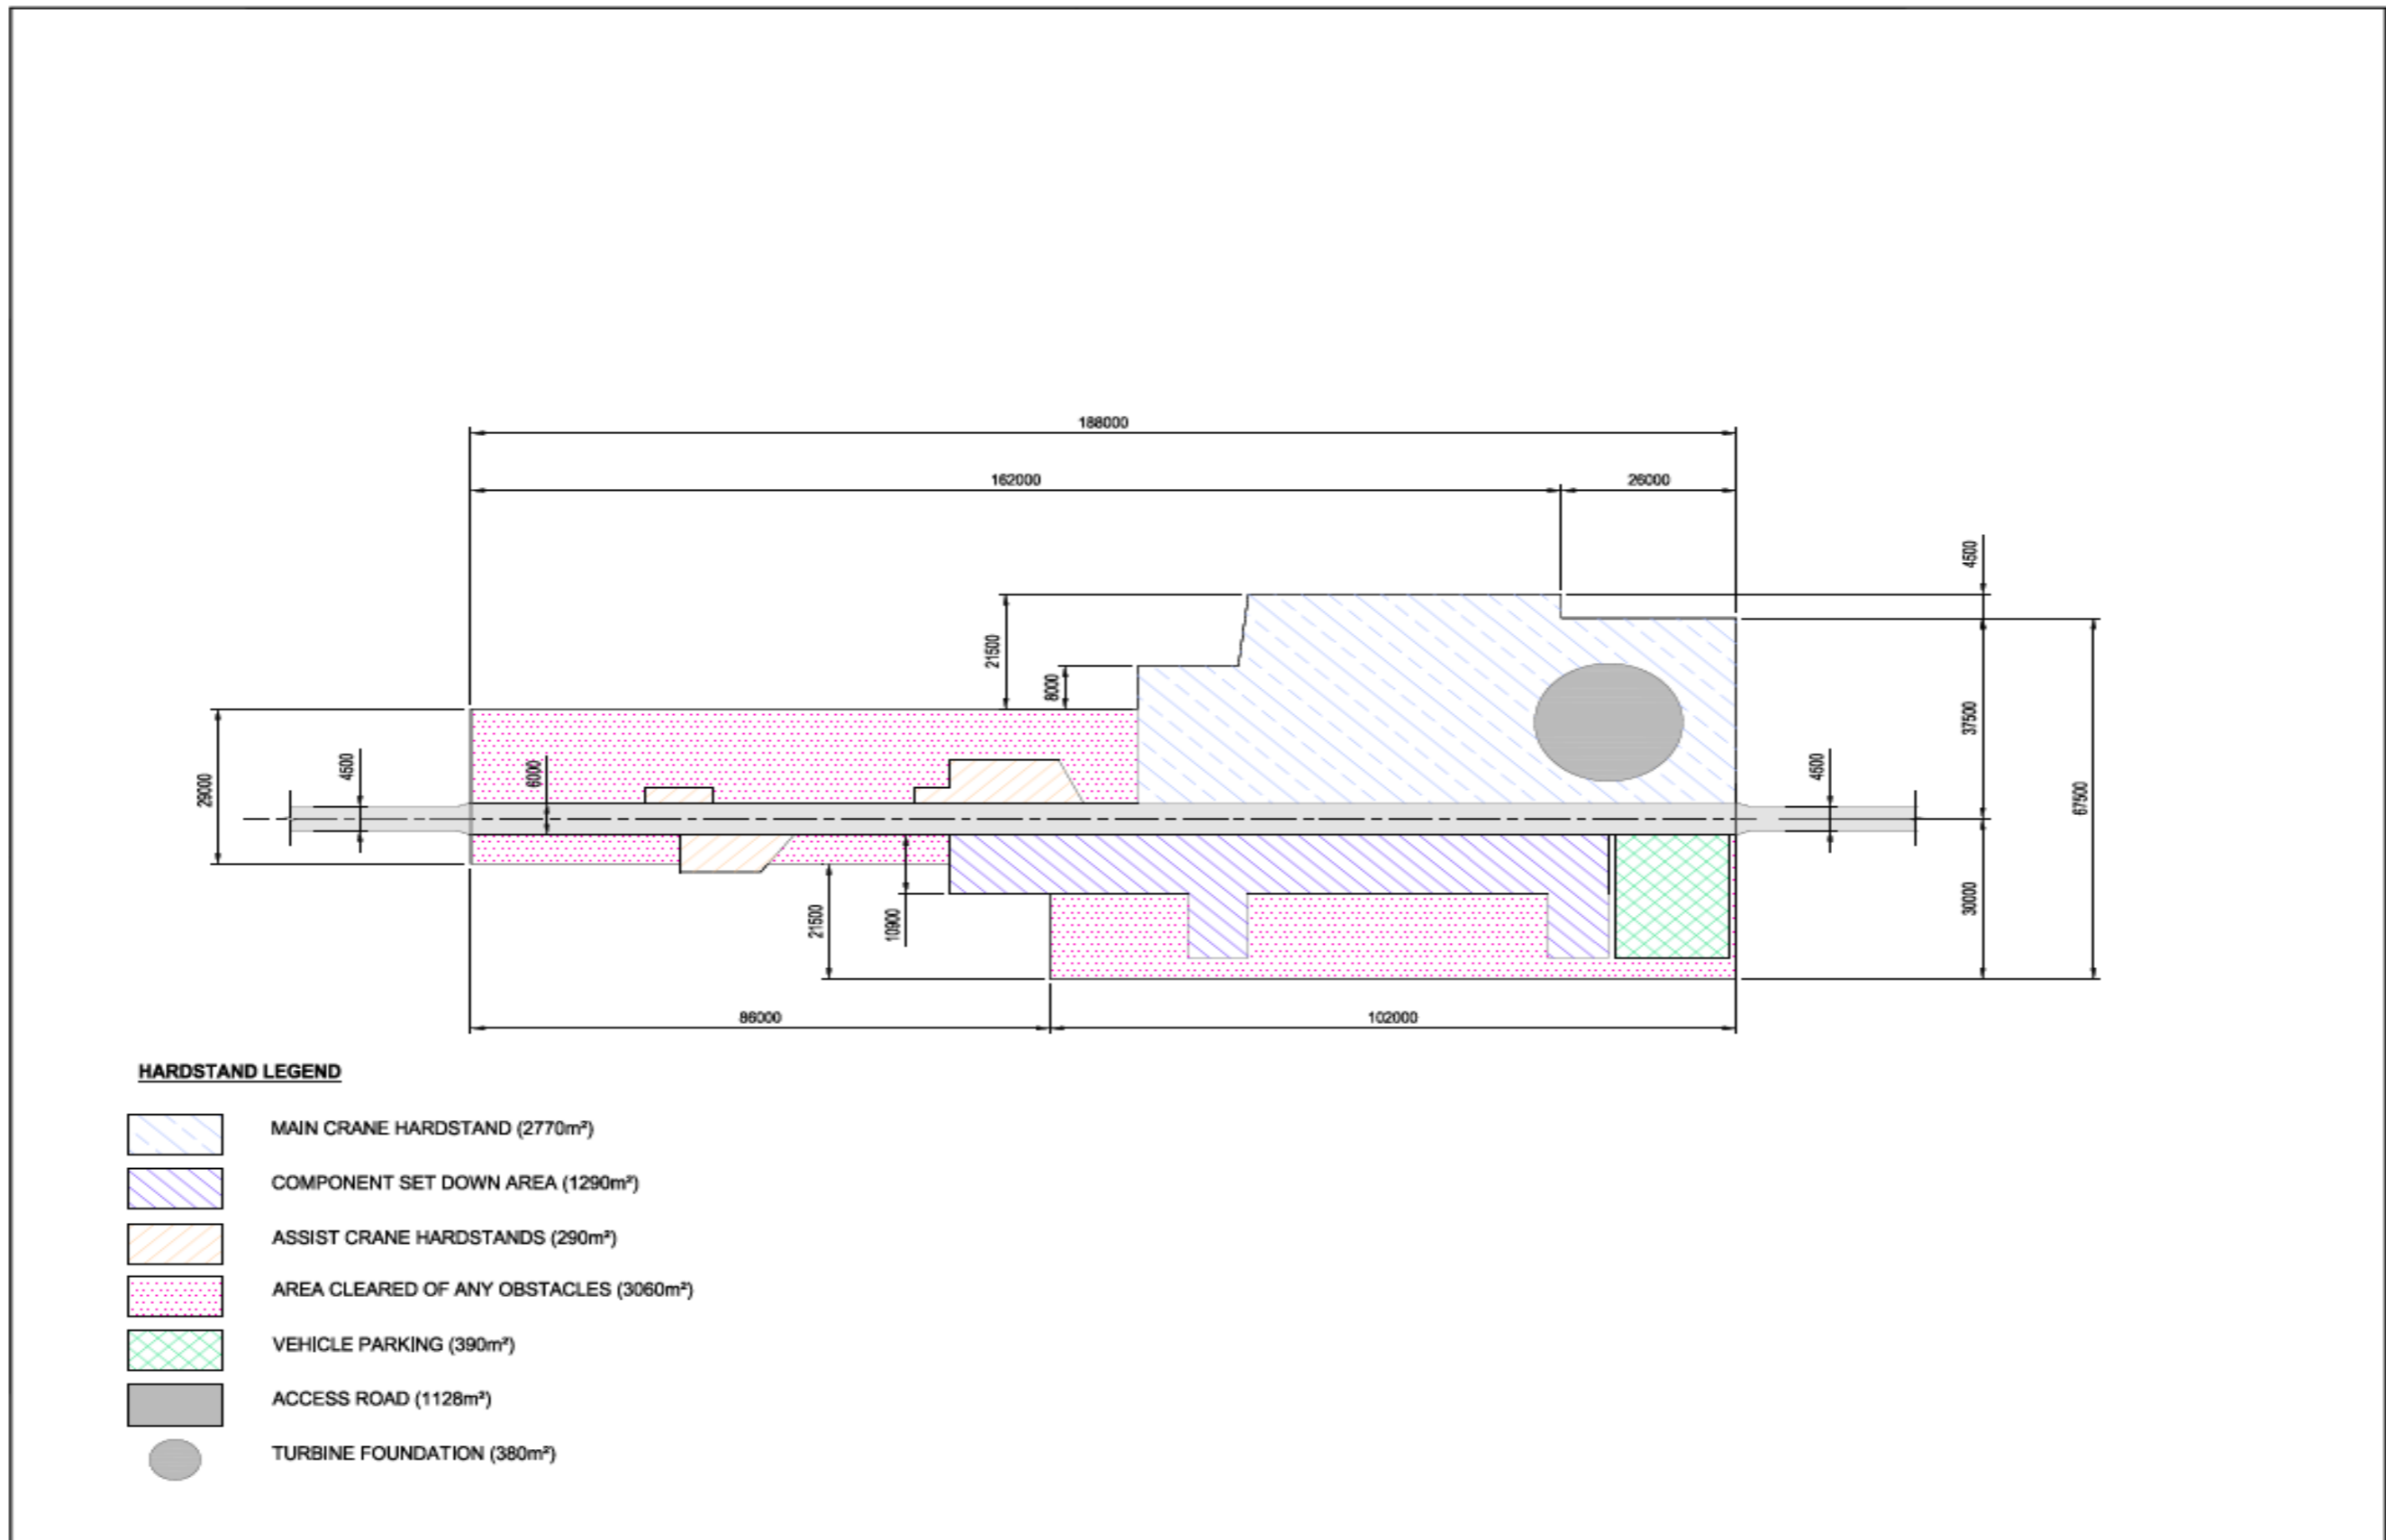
Crane Pad Hardstand Design (Excerpt from Drawing No. 4636-PL-600)
